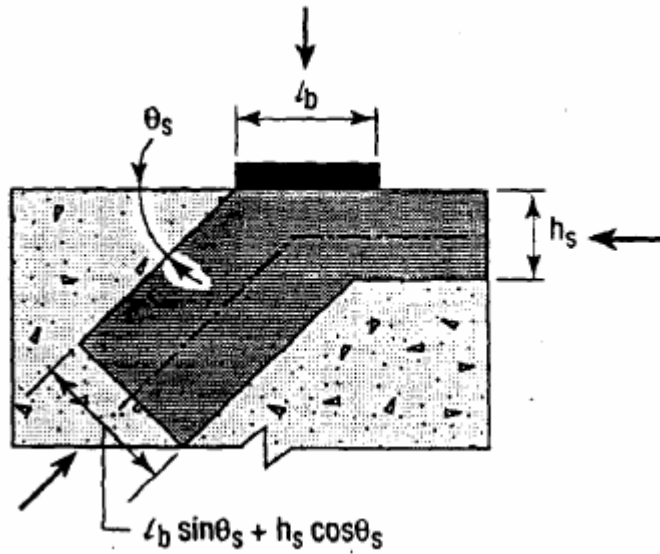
AASHTO LRFD effective area of concrete for strut anchored by bearing and struts
